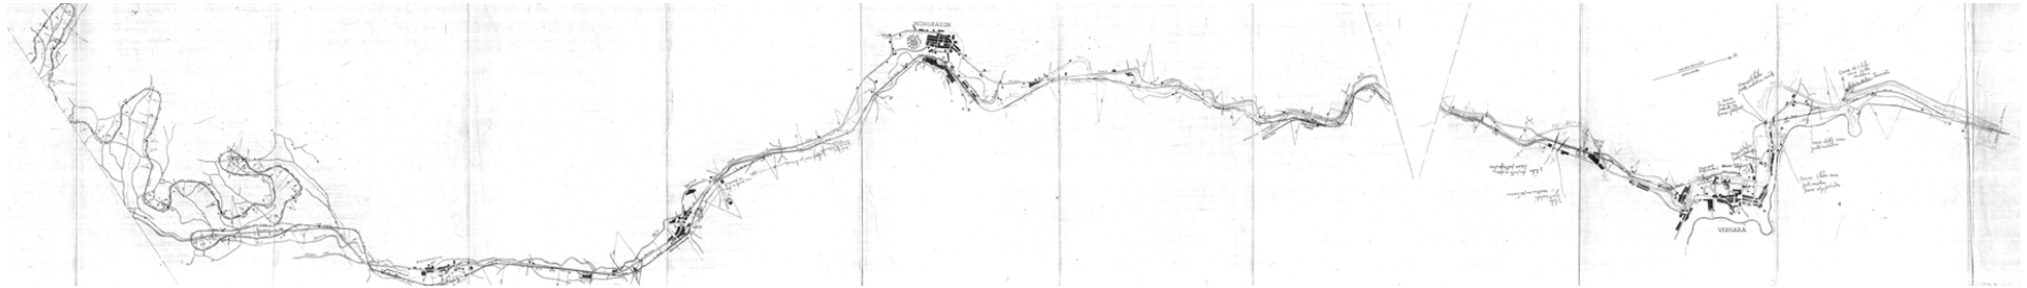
Section of the railway track in excavated areas (Mendizábal, 1926)
